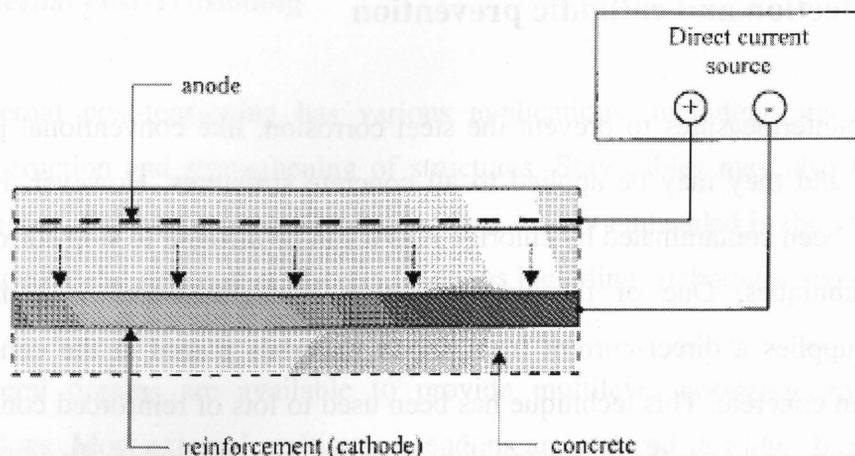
Schematic representation of the cathodic protection system for concrete structures [105]
